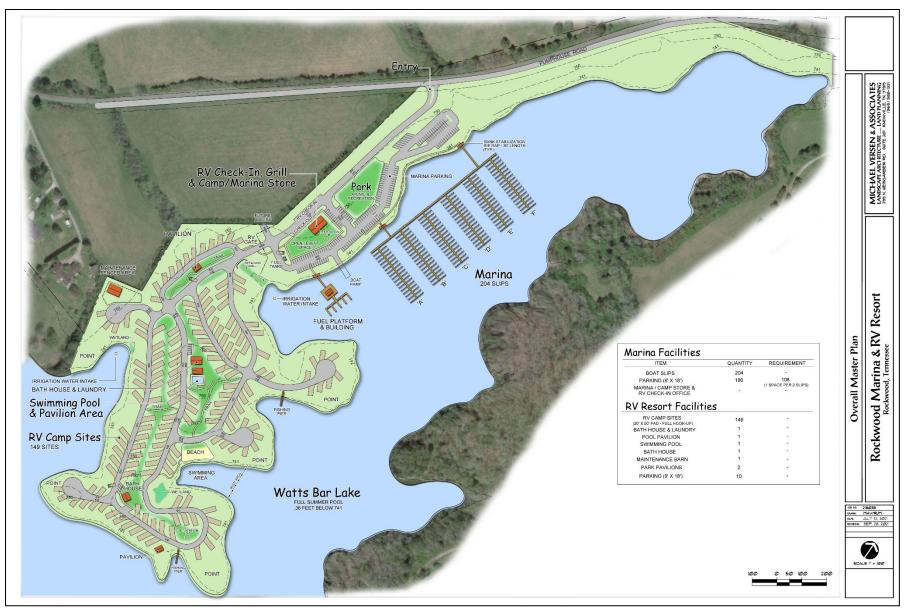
Proposed Rockwood Campground and Marina Master Plan
